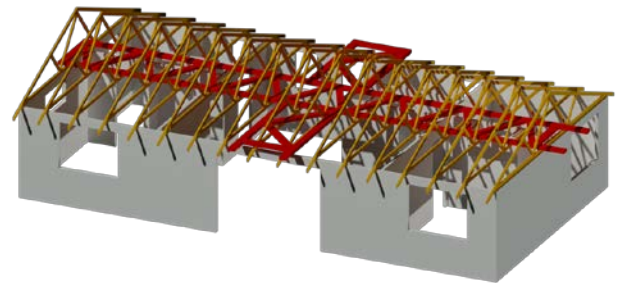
shows the standard house plan with the schematic of a lightweight load truss proposed for installation in the ceiling. The truss is designed to have stiffness slightly less than the ceiling diaphragm in each direction. Quasi-static loads would be applied bi-directionally in the initial tests at the points shown.
